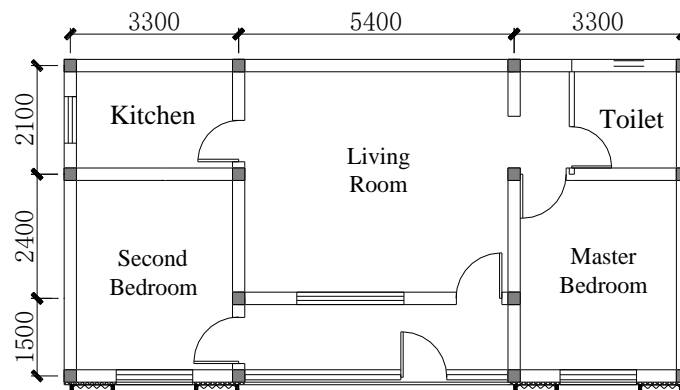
Plane layout and size of the demonstration project (unit: mm)
